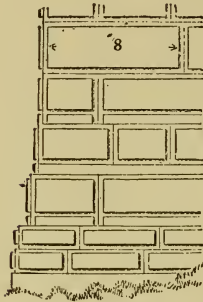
ELEVATION OF PLATFORM AT PASARGADAE.
